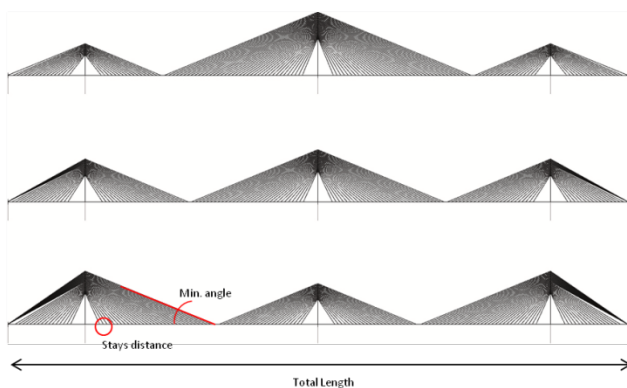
Fixed parameters for a 4 span's cable stayed bridge
